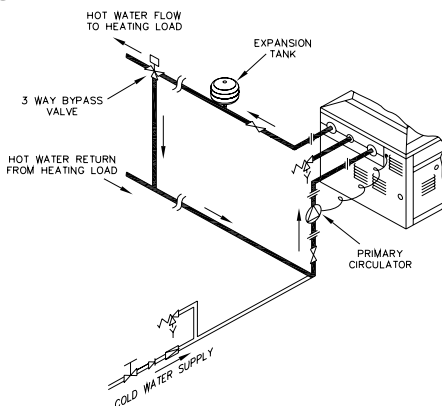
Typical installation Raypak used in mechanical heating applications
